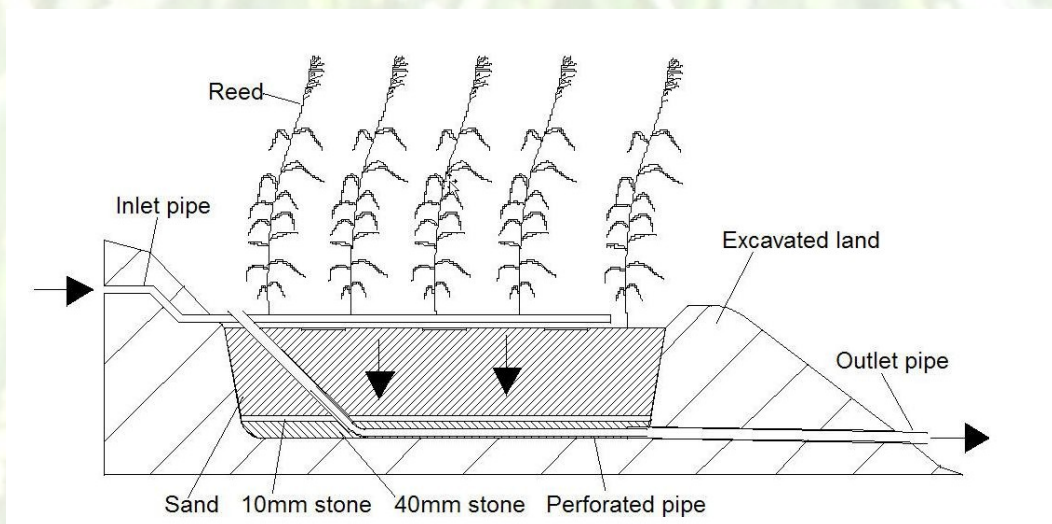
Longitudinal section of a compact vertical-flow constructed wetland.
